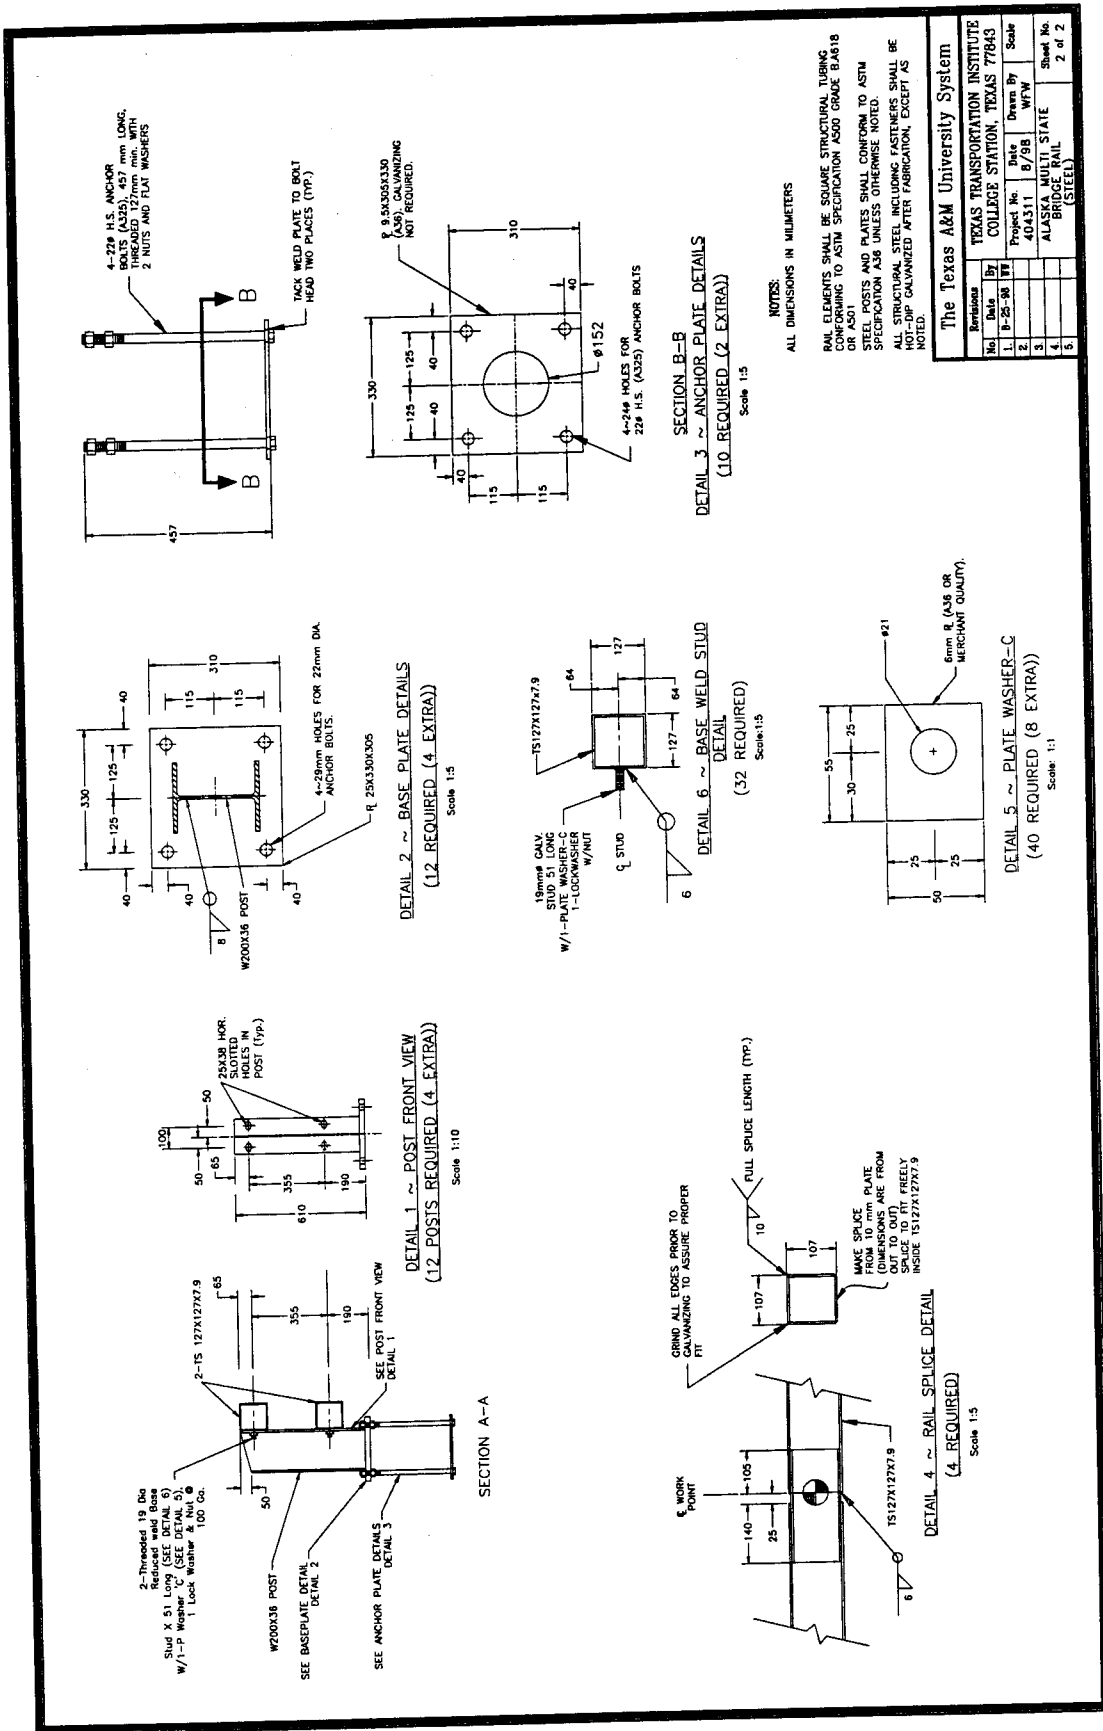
Details of the Alaska Multi-State Bridge Railing mounted on the curb (steel) (continued).
